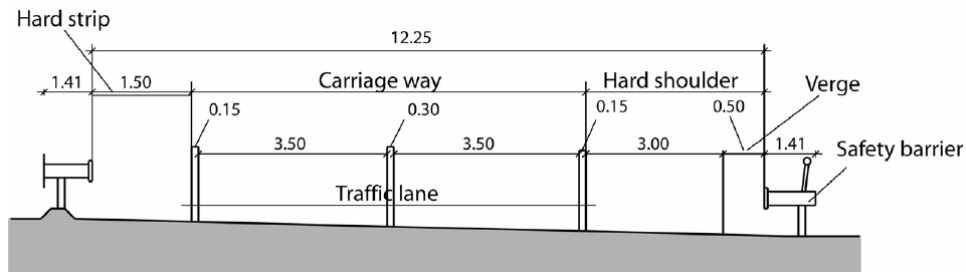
dimensions on a bridge deck (van der Veen, 2014)
